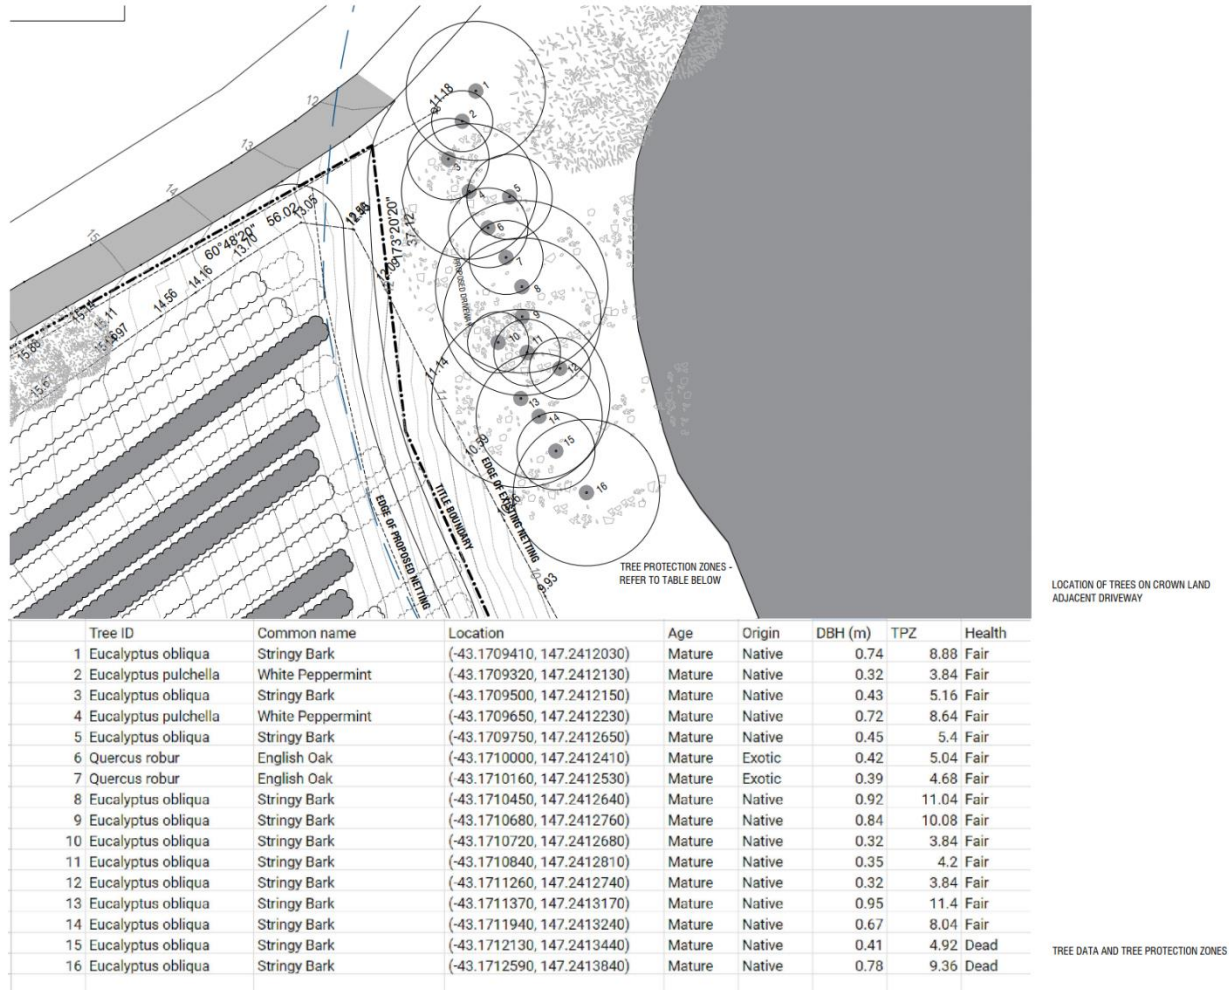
Site plans for the proposed development showing Tree Protection Zones (TPZ). Image shows no encroachment from proposed development.
